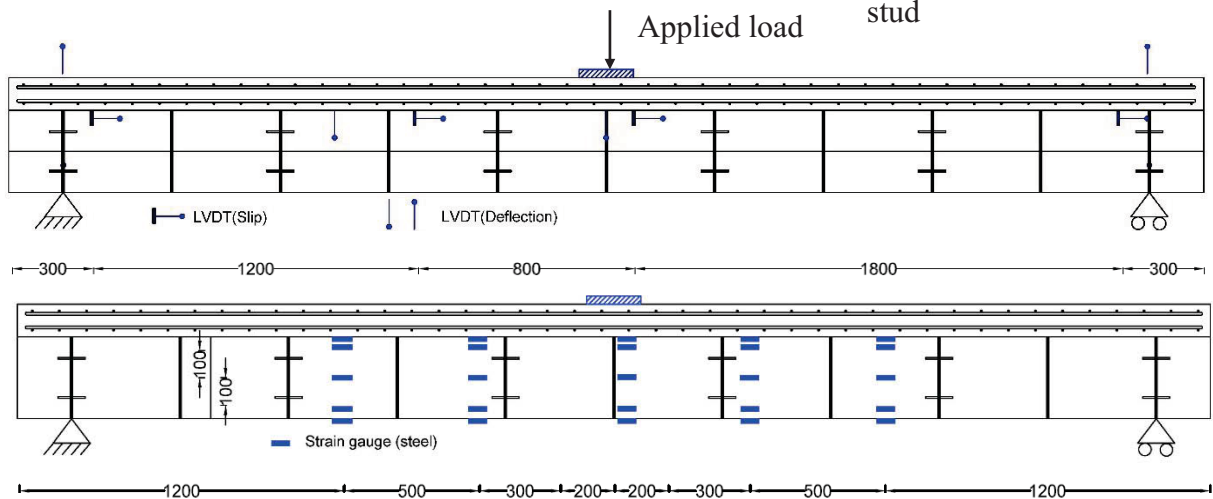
Main Girders, transverse beams, and stud arrangement of test specimens
